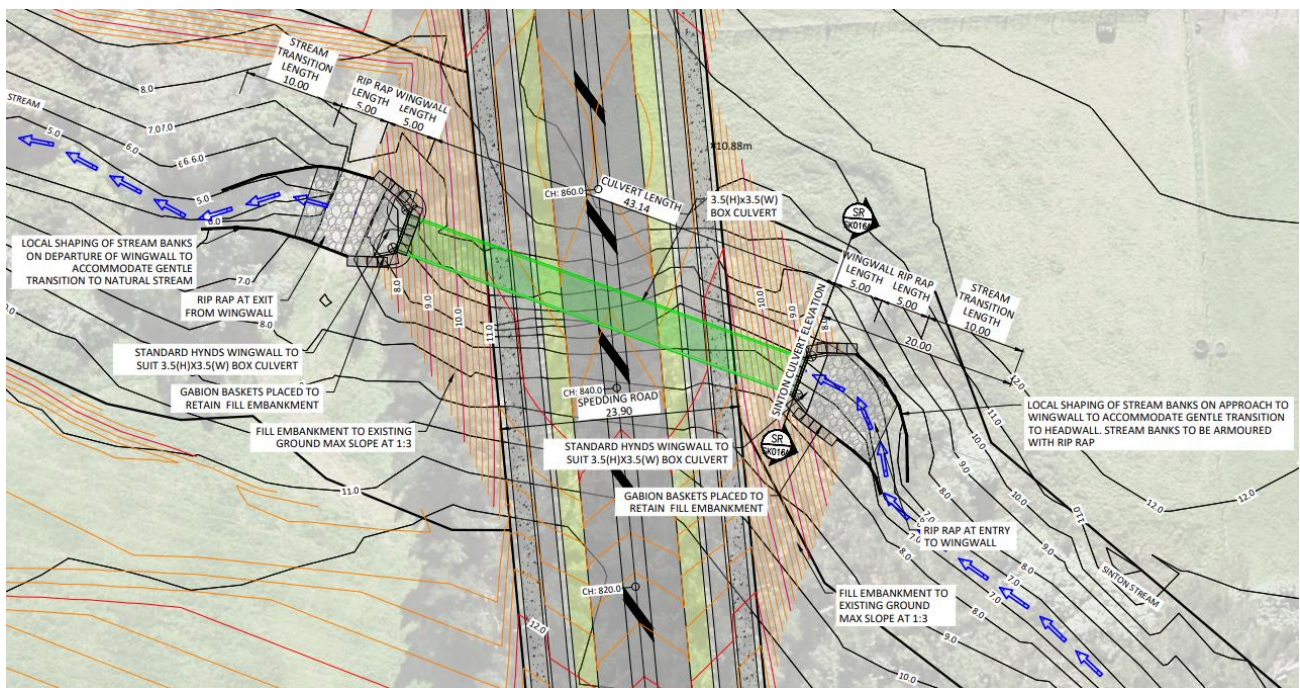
Sinton Stream Culvert (snip from Drawing SK016, Crang Civil Consulting Engineers, provided in Appendix A)
